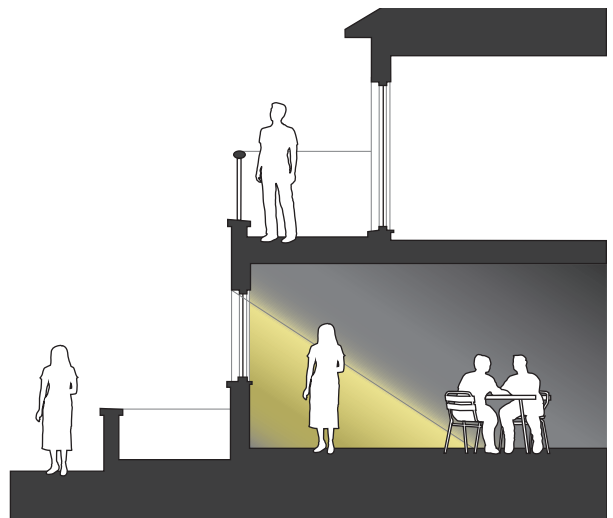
Section showing stepped back rooftop access ways. This gives improved daylight compared to a conventional section (see Figure 10).
